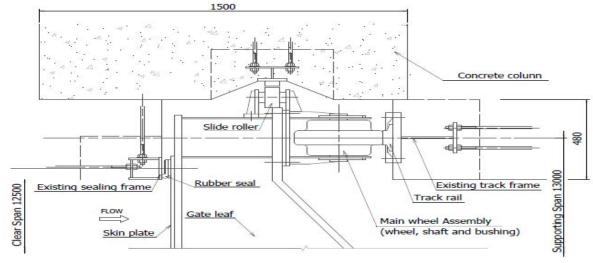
Wheel Assembly of Existing Regulator Gate
